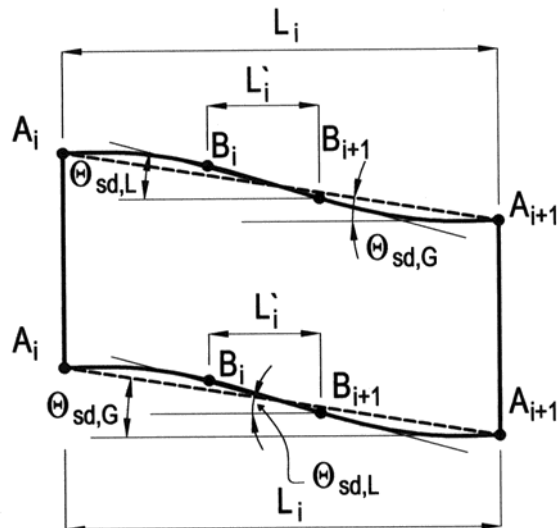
Scheme of deformed masonry wall with openings subjected to irregular settlement
